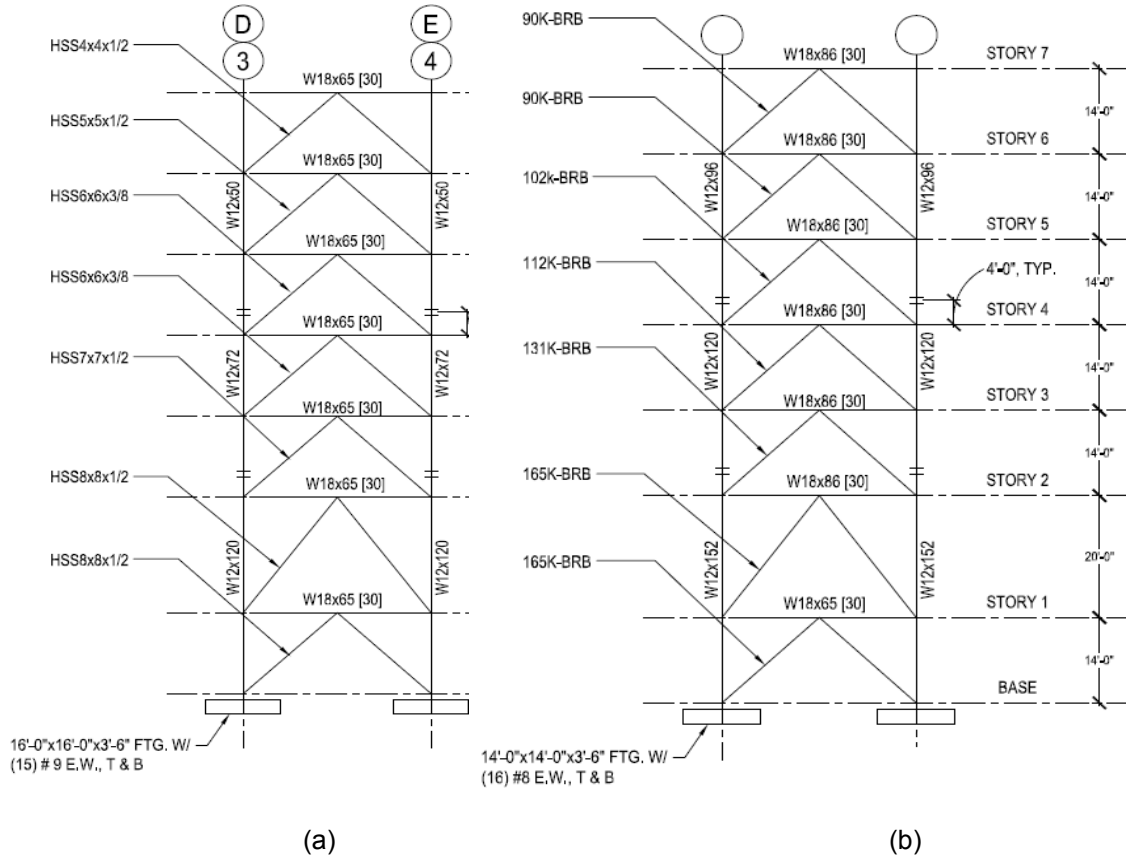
Hospital building braced frame elevations for: (a) wind design; and (b) current local seismic code design.
